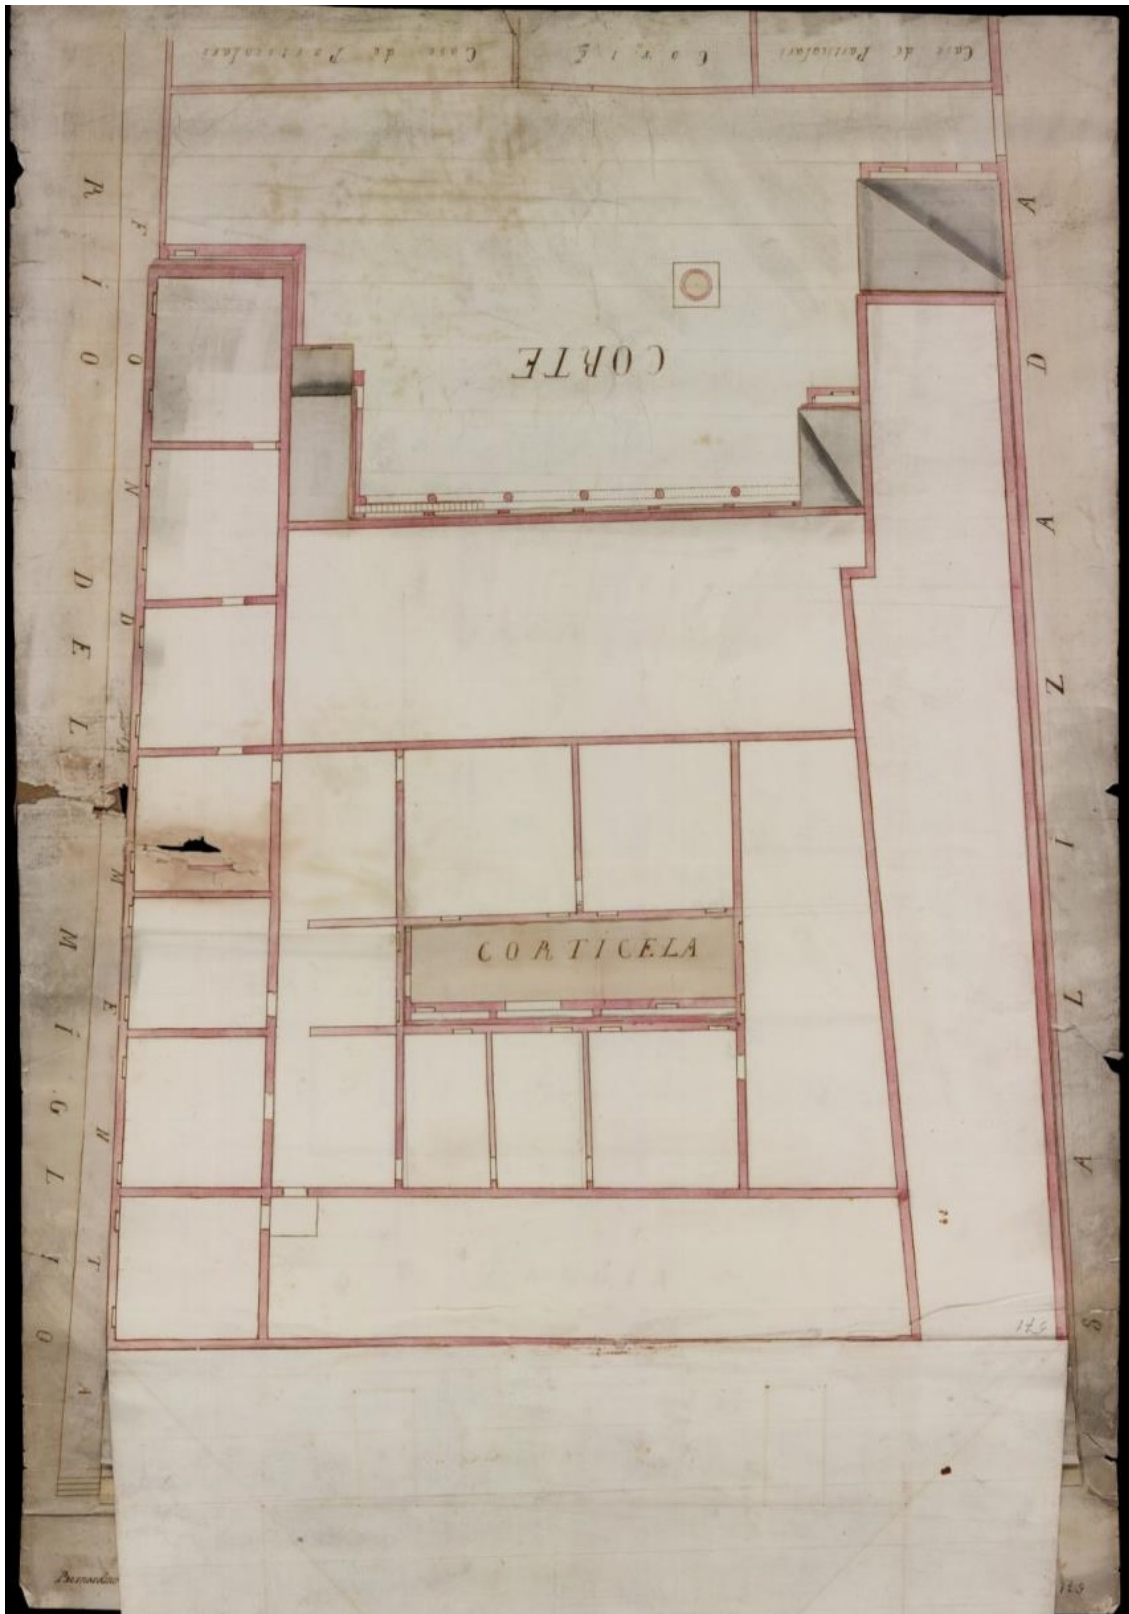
22 Bernardino Maccaruzzi, *Fondaco dei Turchi* – second-floor plan, 1768.
